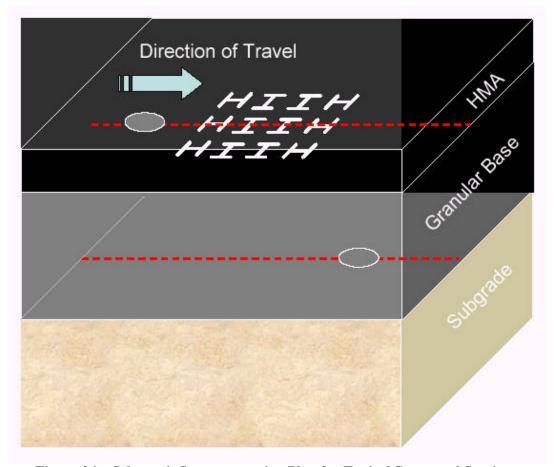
Schematic Instrumentation Plan for Typical Structural Sections
